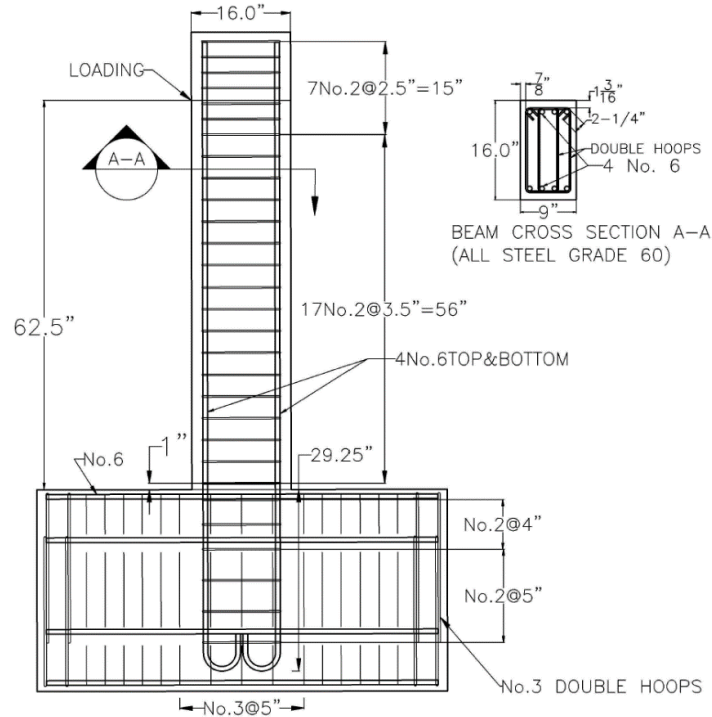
Reinforcement Details for Beam R-6 (Ma et al.) (Drawing has been redone for clarity)
